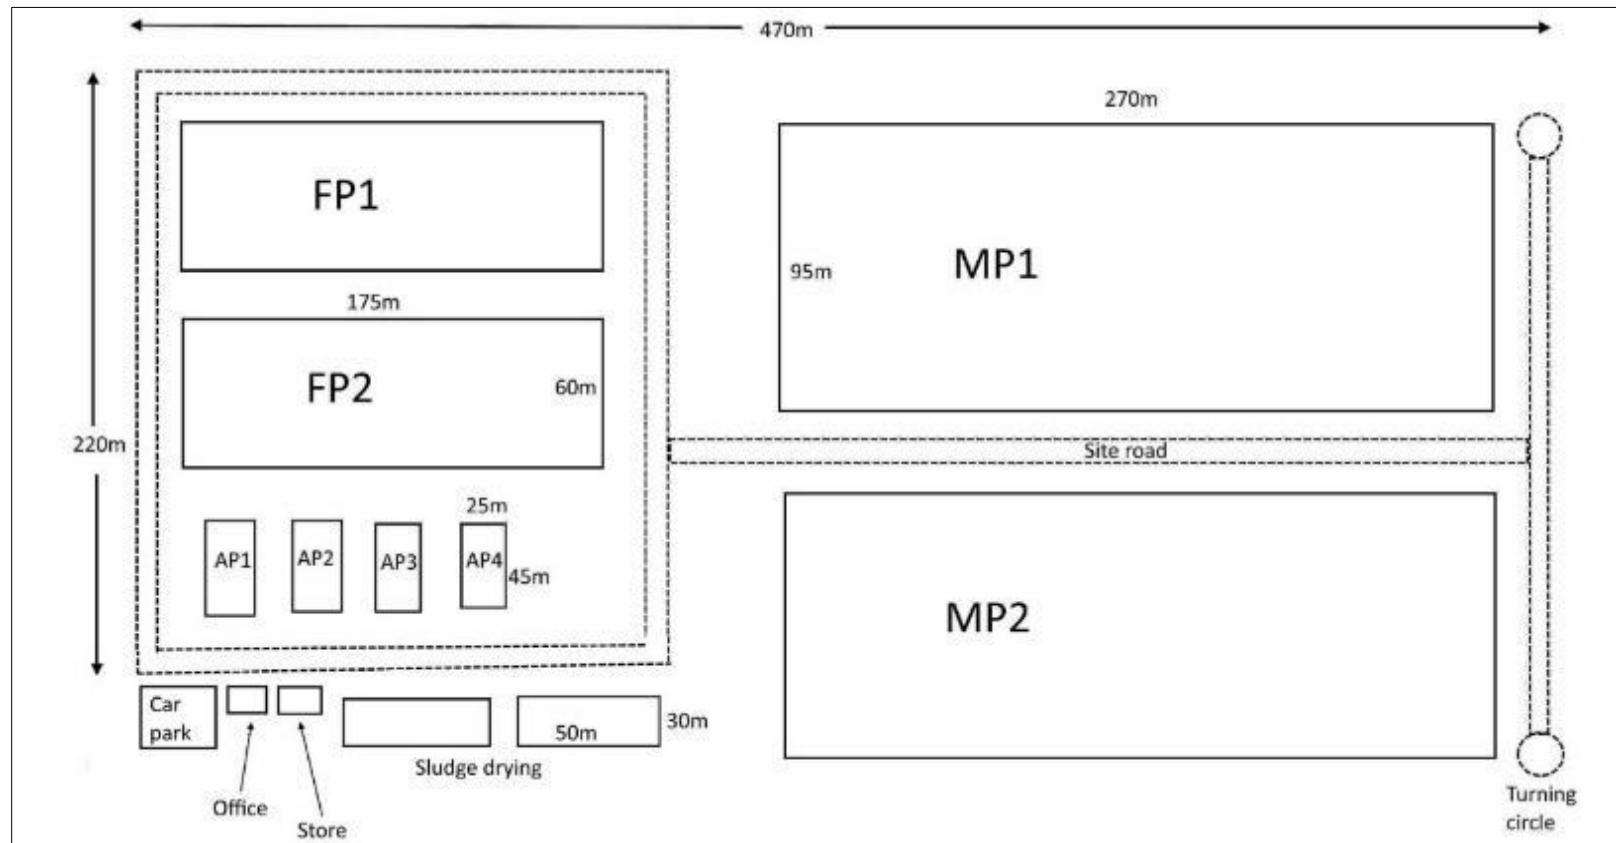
Conceptual Layout of the Proposed Kratie Wastewater Treatment Plant
